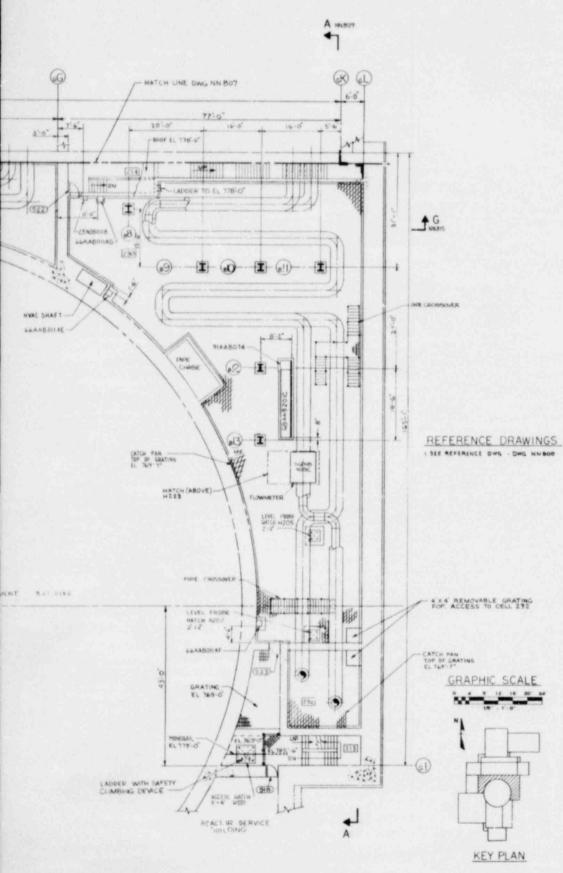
General Arrangement Steam Generator Building Plan El. 765'-0"
